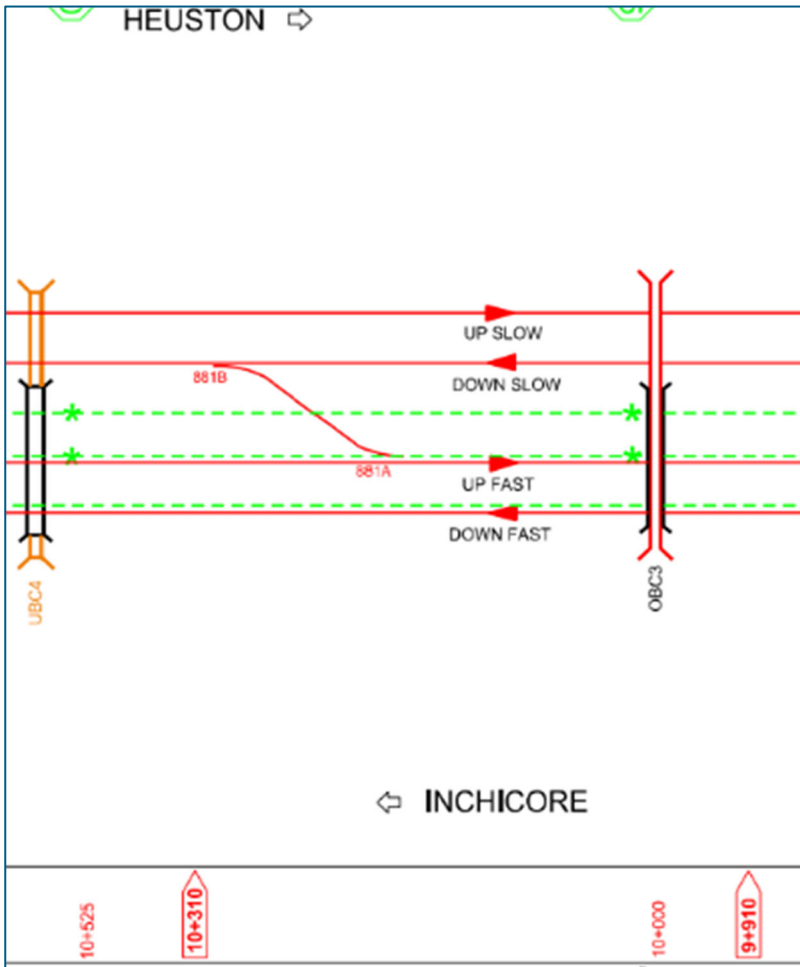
Sarsfield Road Bridge (UBC4) to Memorial Road Bridge (OBC3) Track Plan Layout
